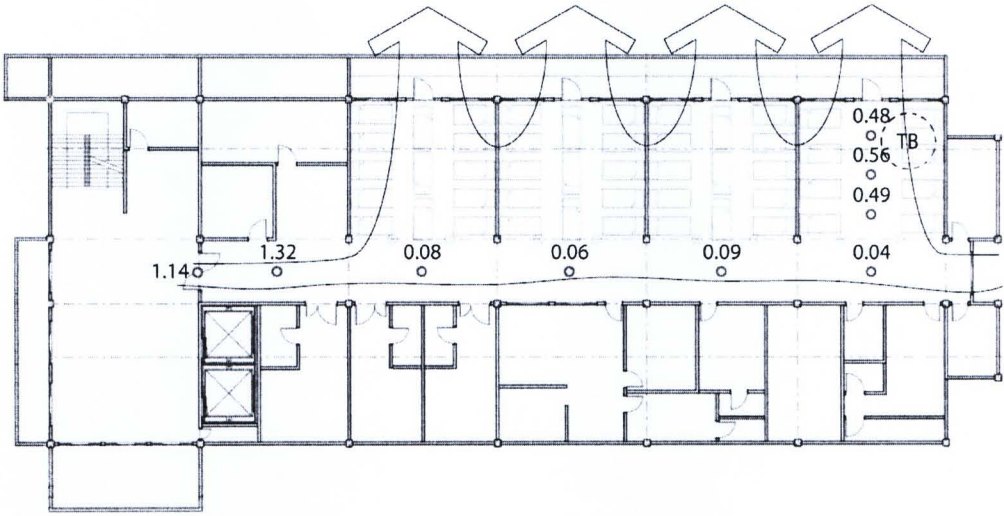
Floor plan and ventilation data of hospital C inpatient ward
